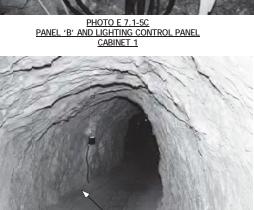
C EXIT TUNNEL INSTALLED LIGHTING - GENERAL VIEWS
